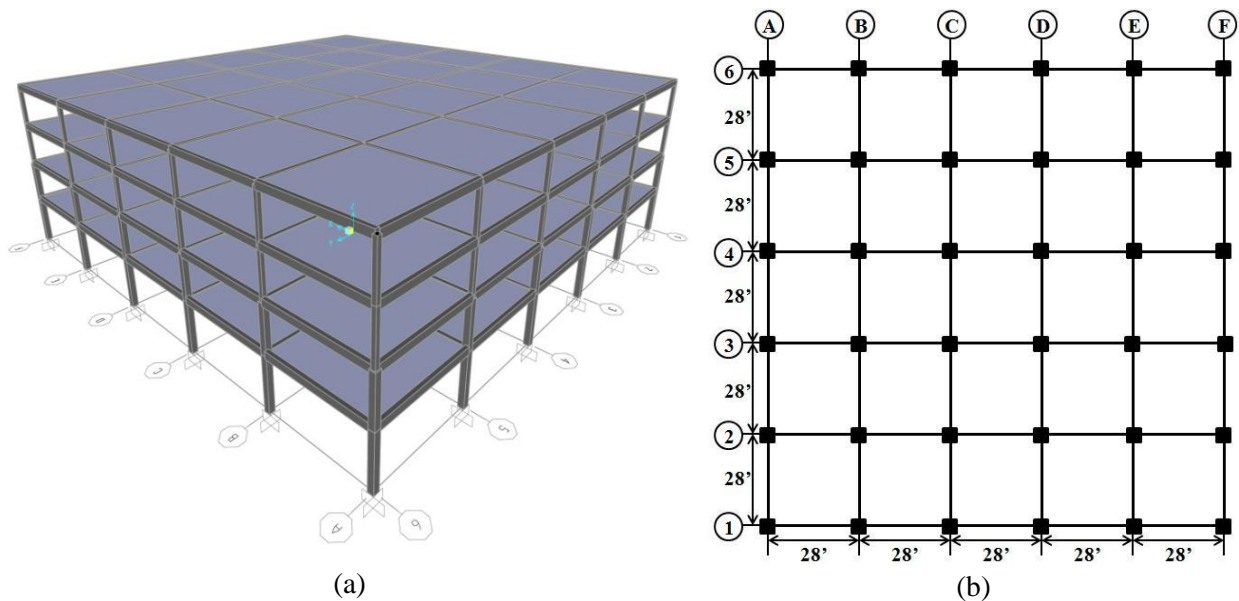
Prototype RC frame building: (a) 3D view and (b) floor plan.
